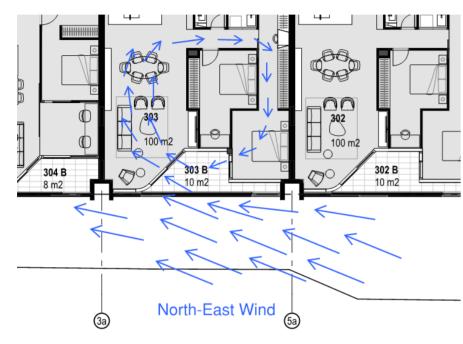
Flow pattern around a single-sided apartment with articulated façade
